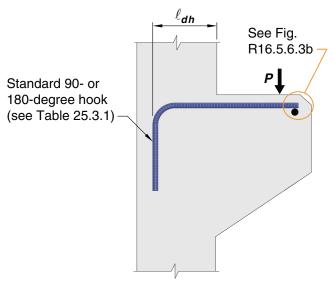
Member largely dependent on support and end anchorages.
